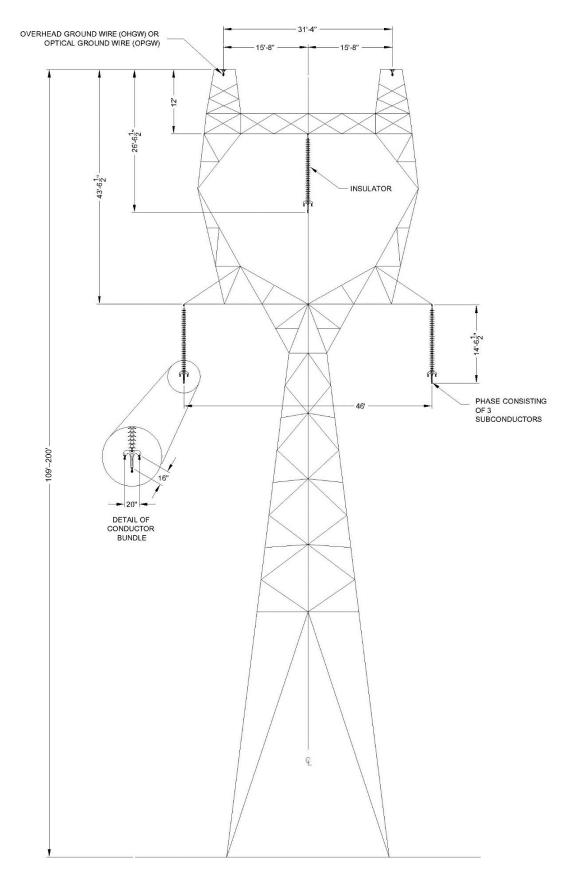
Proposed 500-kV Single-Circuit Lattice Steel Structure
